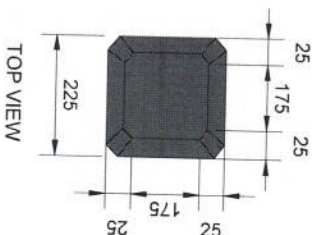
DETAIL C: PRE-CAST CONCRETE MARKER BLOCK FOR ROAD CROSSING SLEEVES END POSITION MARKER DETAILS
